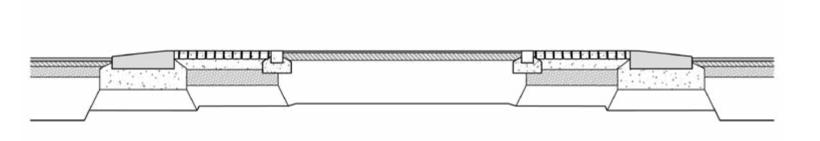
Typical Cross Section of Access using Dutch Entrance Kerb
